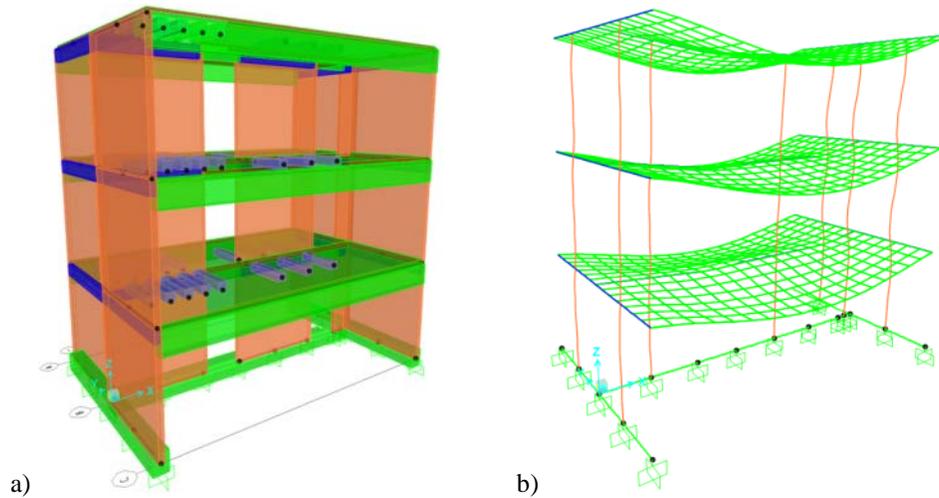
Numerical model using wide column method: a) Geometry, b) Deformed shape for gravity load case
